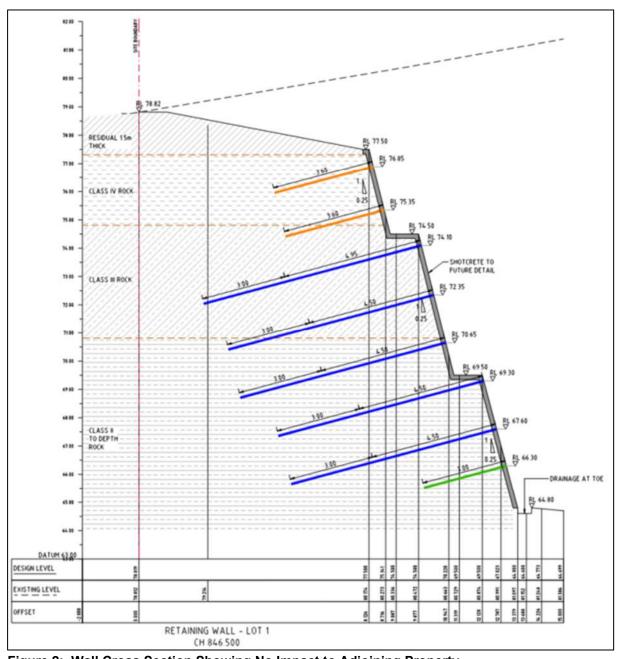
Wall Cross Section Showing No Impact to Adjoining Property
